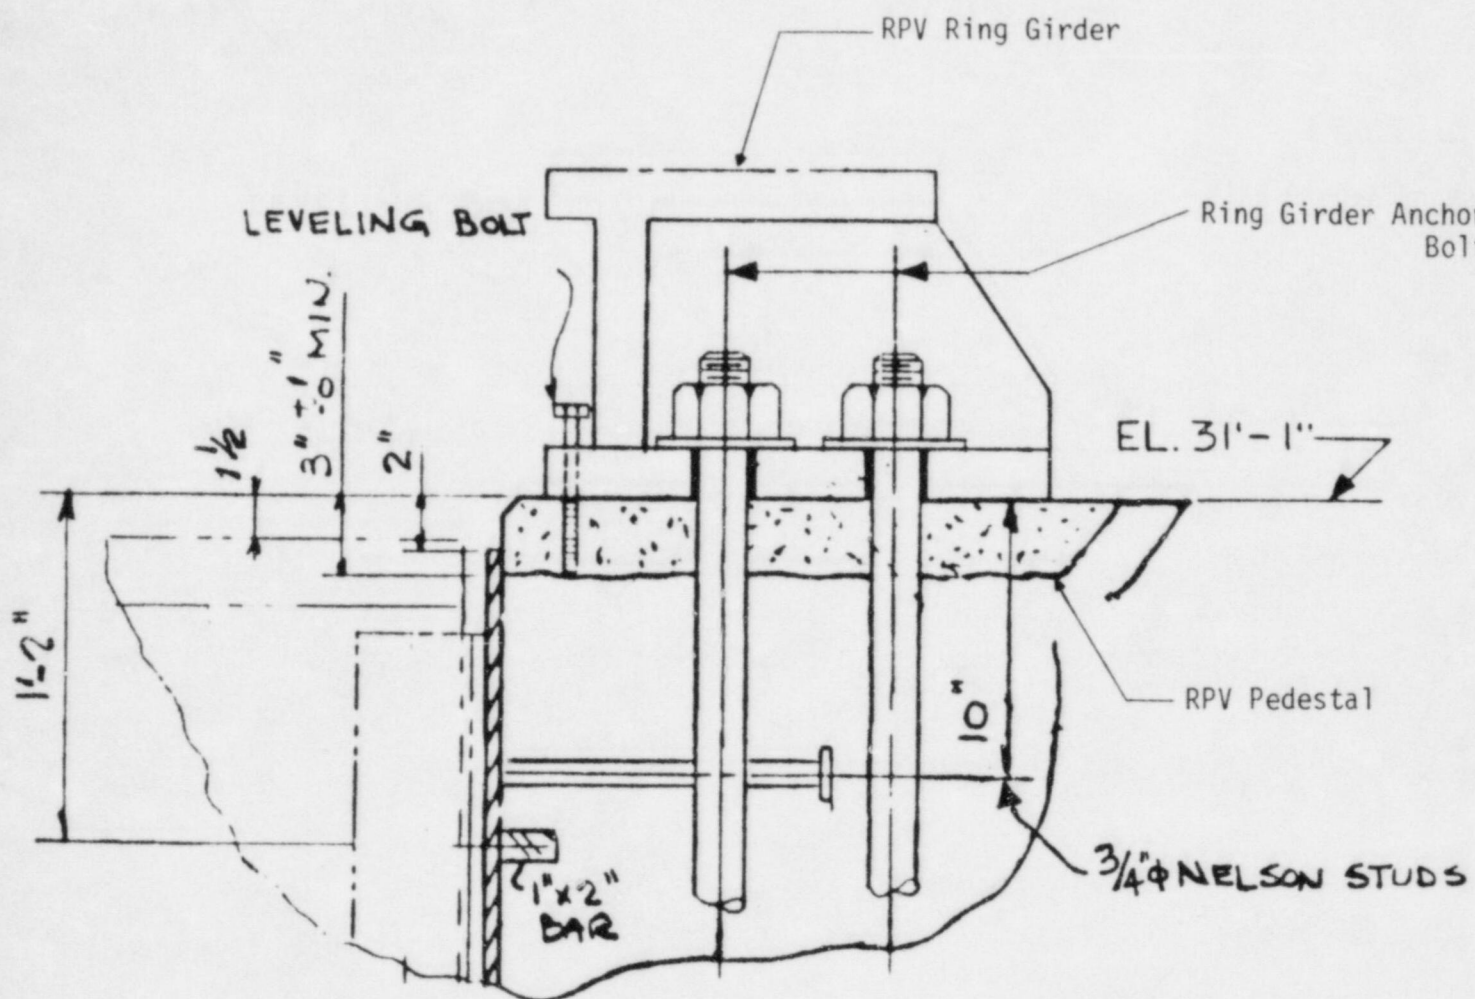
RPV RING GIRDER TO PEDESTAL ANCHORAGE
